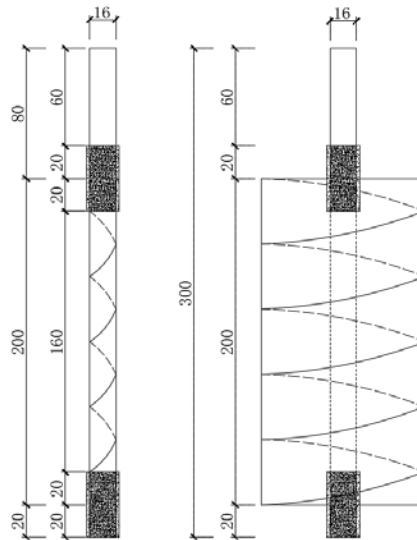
Sketch of the cylinder specimen and DOFS arrangement (unit in mm).
